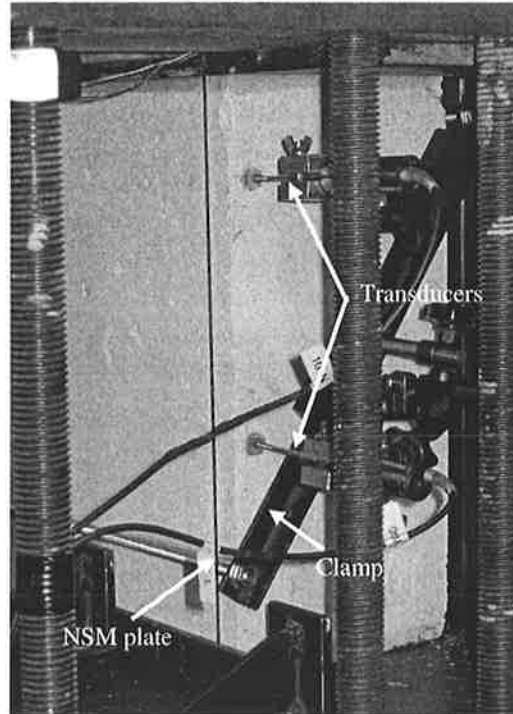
Transducers were placed next to the specimen using clamp.
